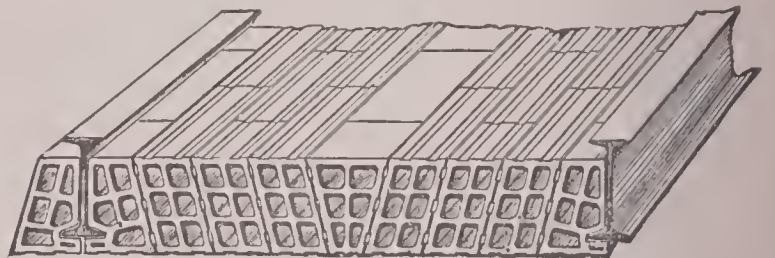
Horizontal floor-arch of hollow brick protecting beam-flanges (Maurer's).
